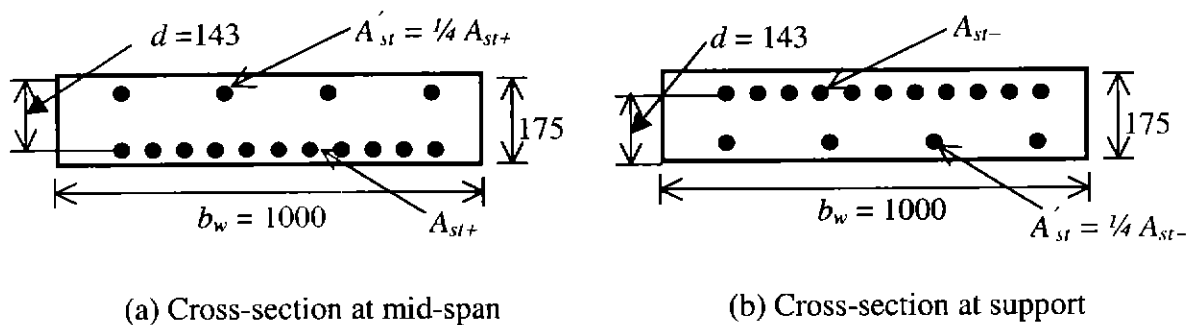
Cross-Sections of One-Way Slab (Dimensions are in mm)
